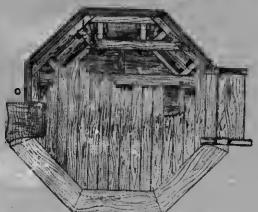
Part Plan and Horizontal Section of Pulpit at A (Fig. 1550).
